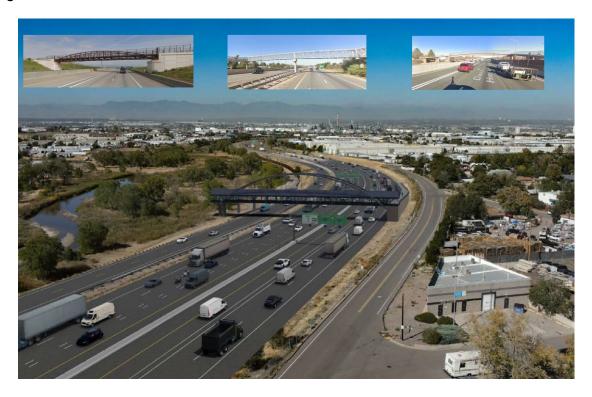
Rendering of the New Pedestrian Overpass - Facing Northwest Toward the Front Range
